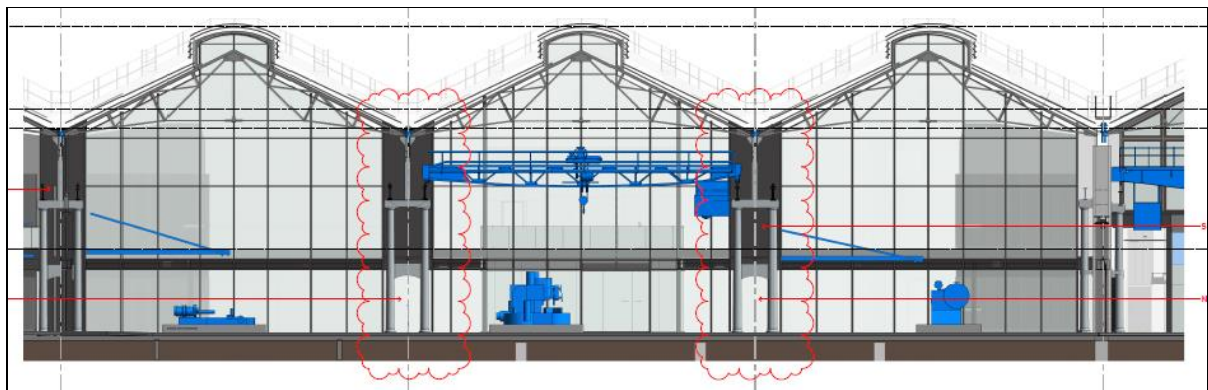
| Proposed full height glazing, Bays 5-7 north (Source: Amended architectural plans)
